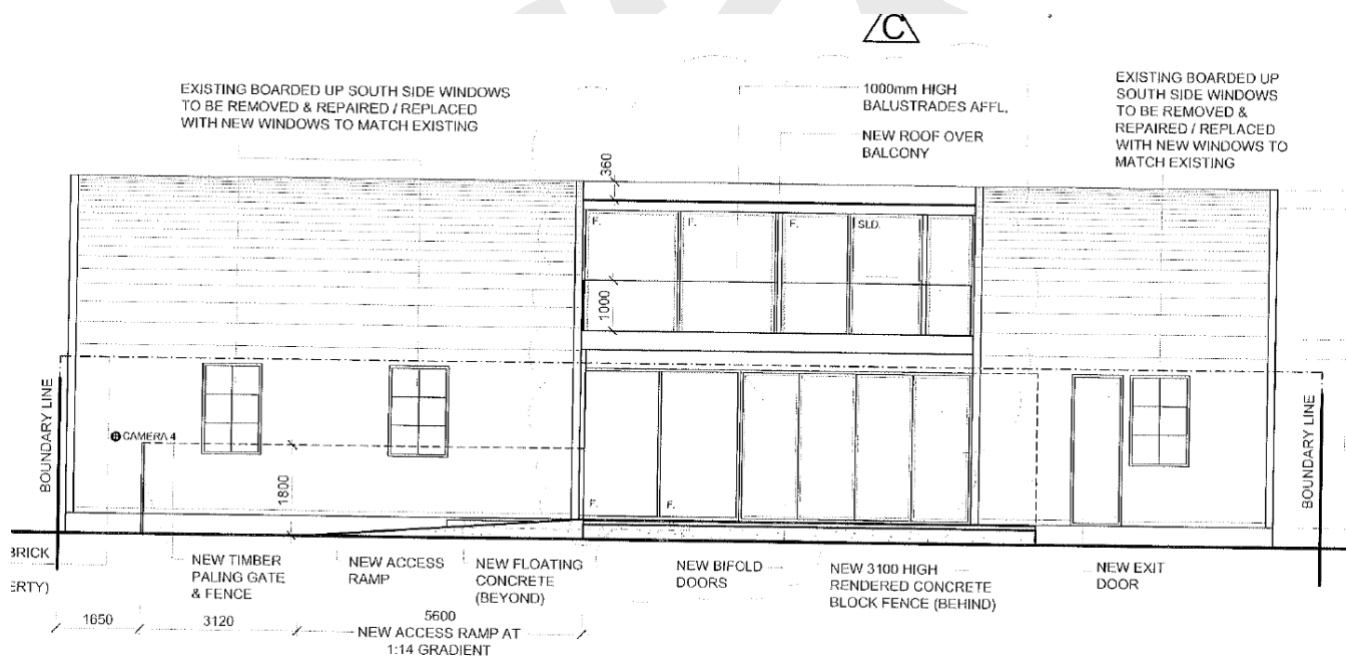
South elevation showing proposed works. Drawing dated 2009 (YCC BP).
